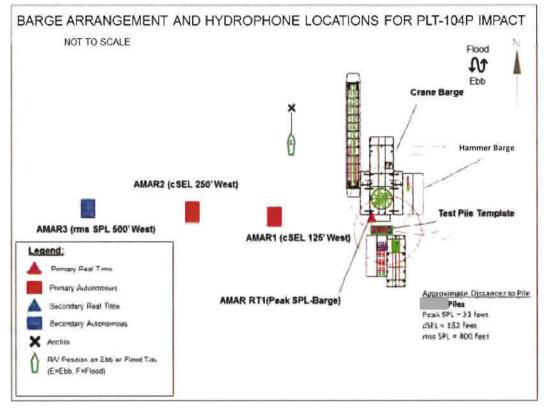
Plan view of pile and barge layout, 12 September 2013, Test Pile PLT-104P.
